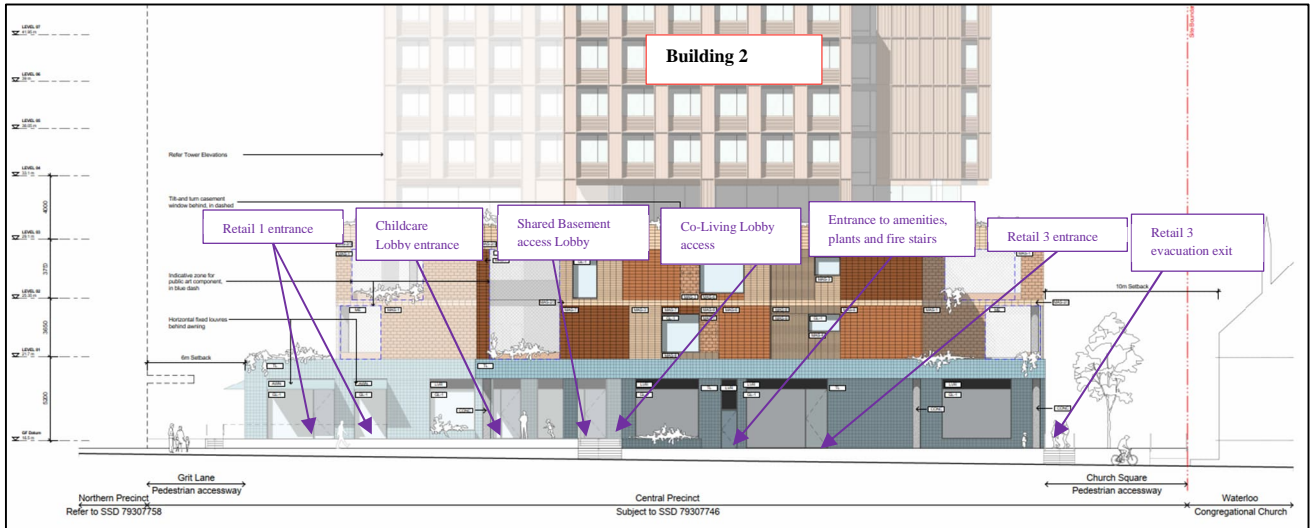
Central Precinct external elevation – west view (from Botany Rd)
